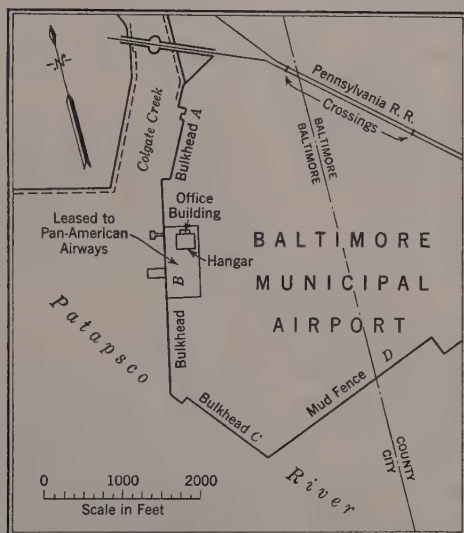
GENERAL LAYOUT OF THE AIRPORT
